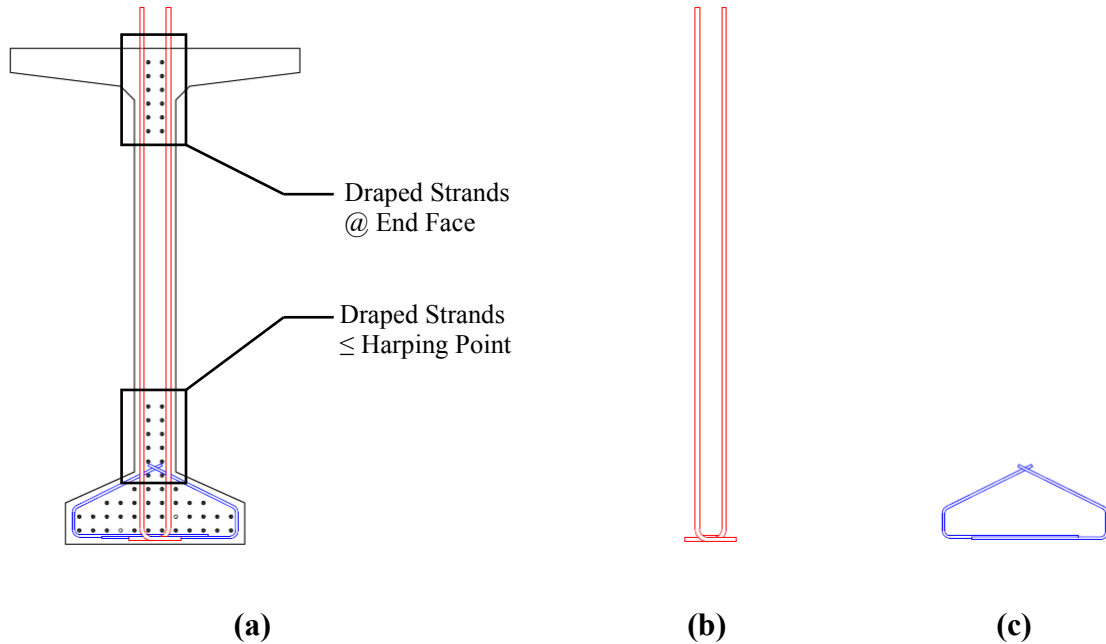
Typical cross-section of BT-72 girder: (a) Typical cross-section including the strands, end zone and confinement reinforcement, (b) Typical No.5 end zone rebar to be spaced in sets of two per design (double No.4 shear reinforcement have the same configuration), and (c) Typical No.3 confinement rebar spaced with end zone and shear reinforcement but not more than 6 in. on center.
